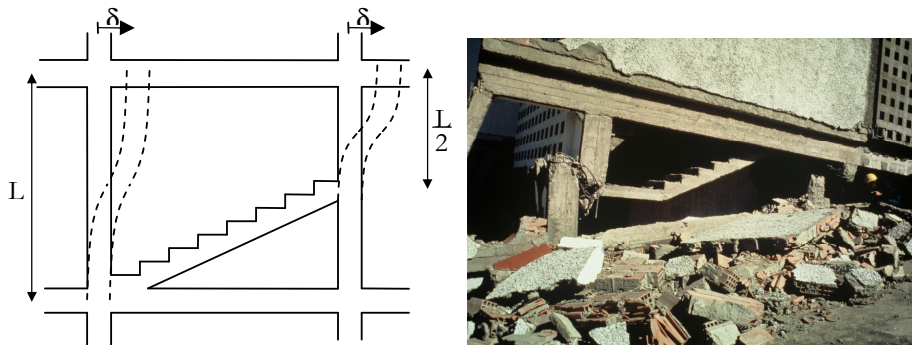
Restriction to column deformation due to stairs and potential consequences
